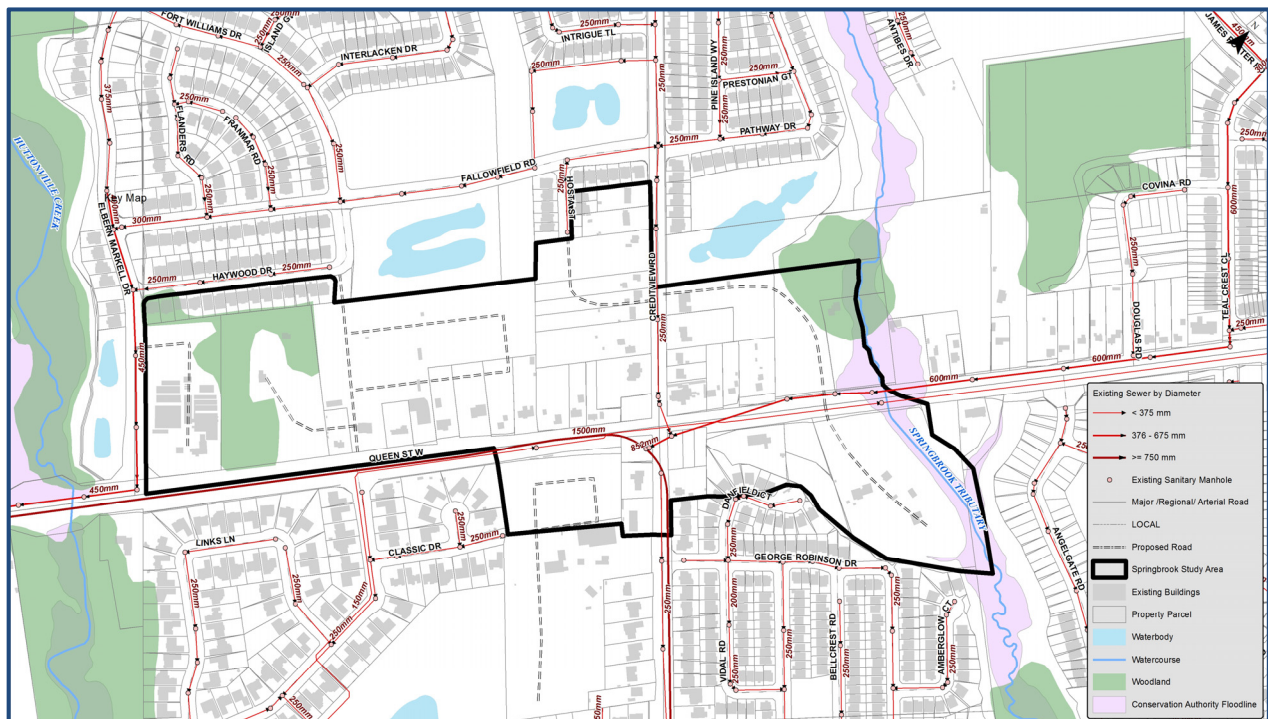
EXISTING WASTEWATER INFRASTRUCTURE IN THE VICINITY OF PROPOSED DEVELOPMENT
